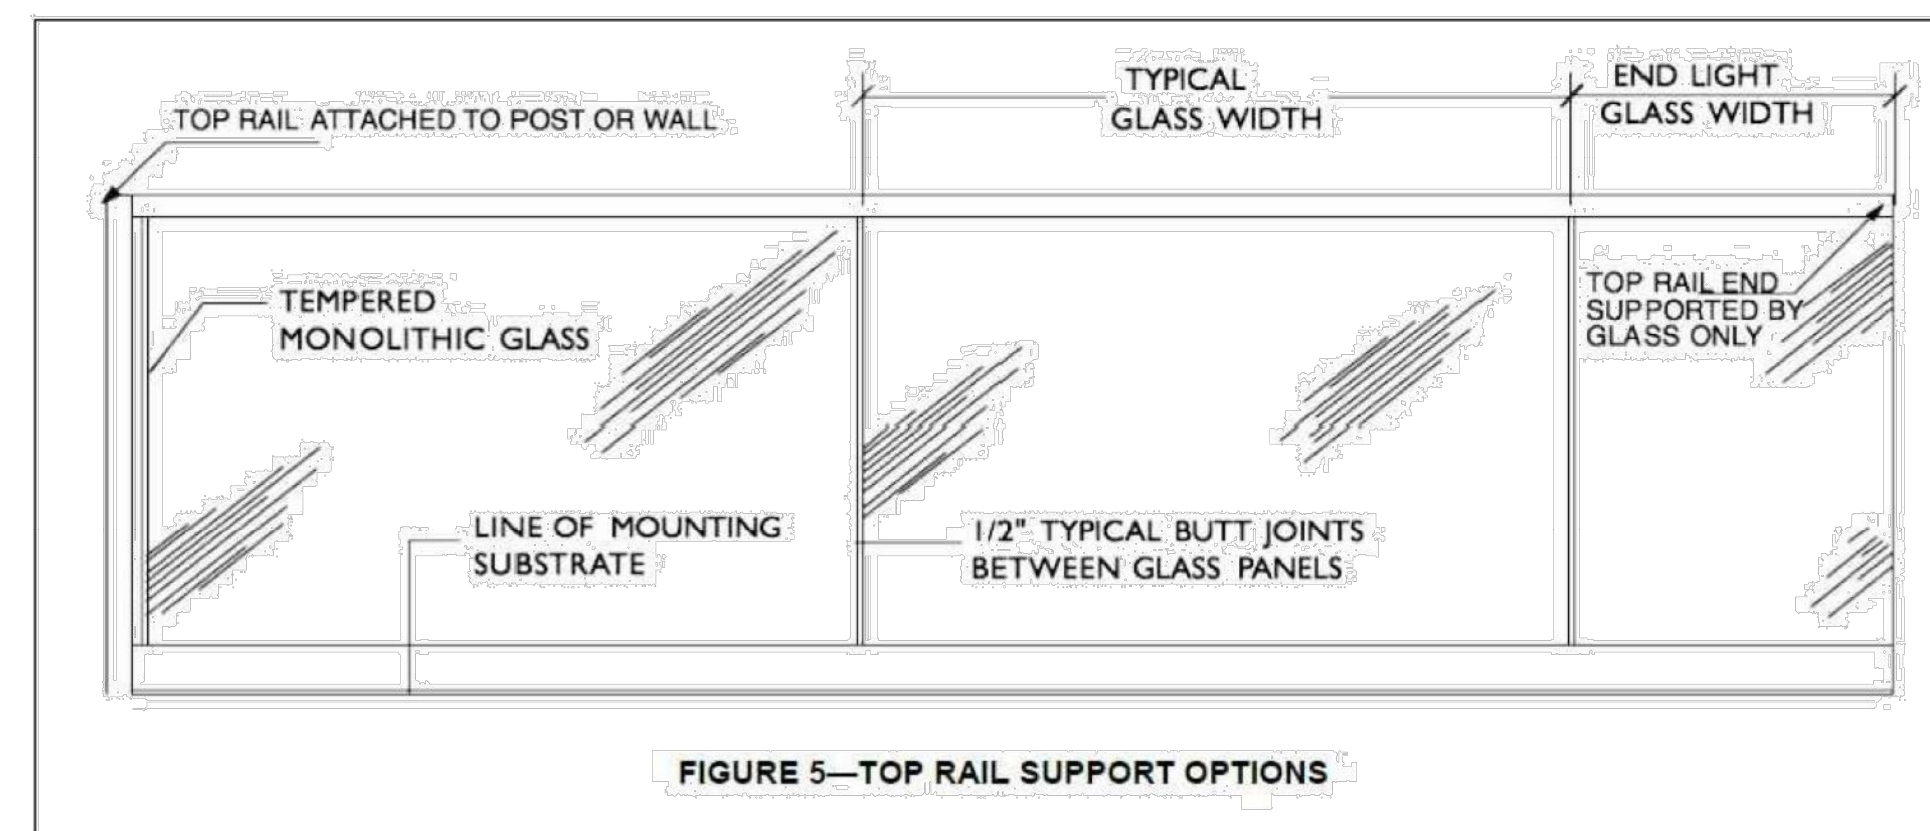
TOP RAIL SUPPORT OPTIONS
